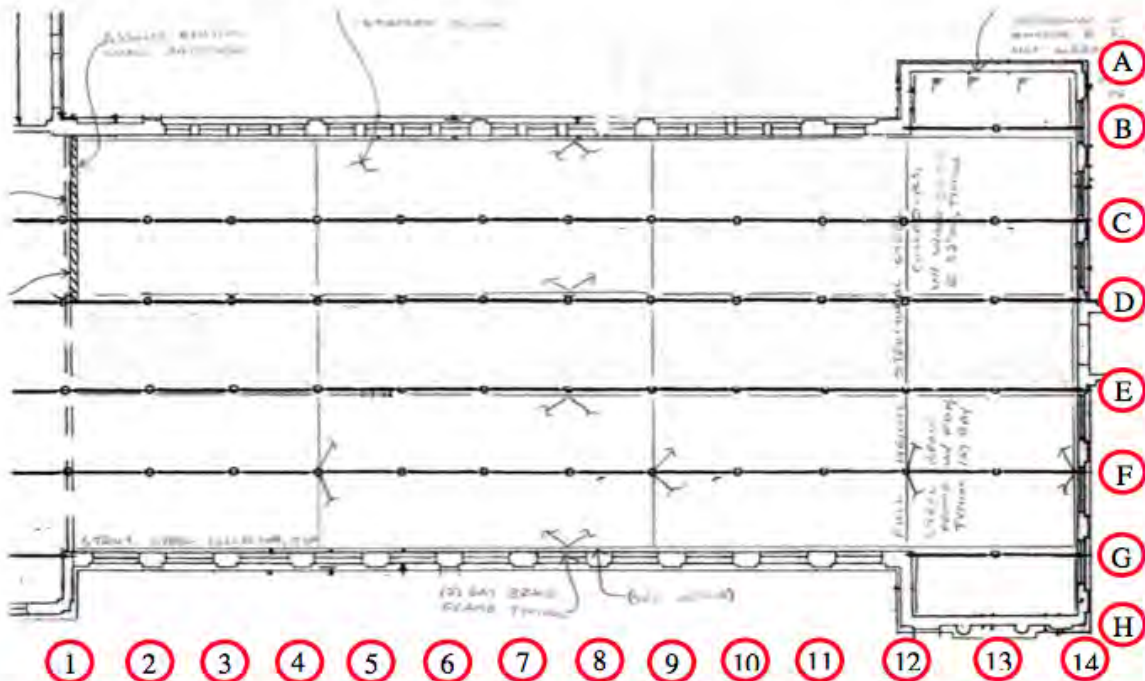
Plan view of the west wing. Column lines have been added to facilitate discussion.
